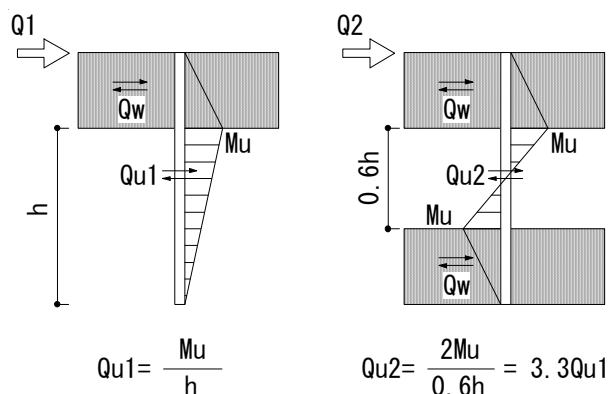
(left) Pillars with hanging wall, (right) Pillar restraint on both sides
